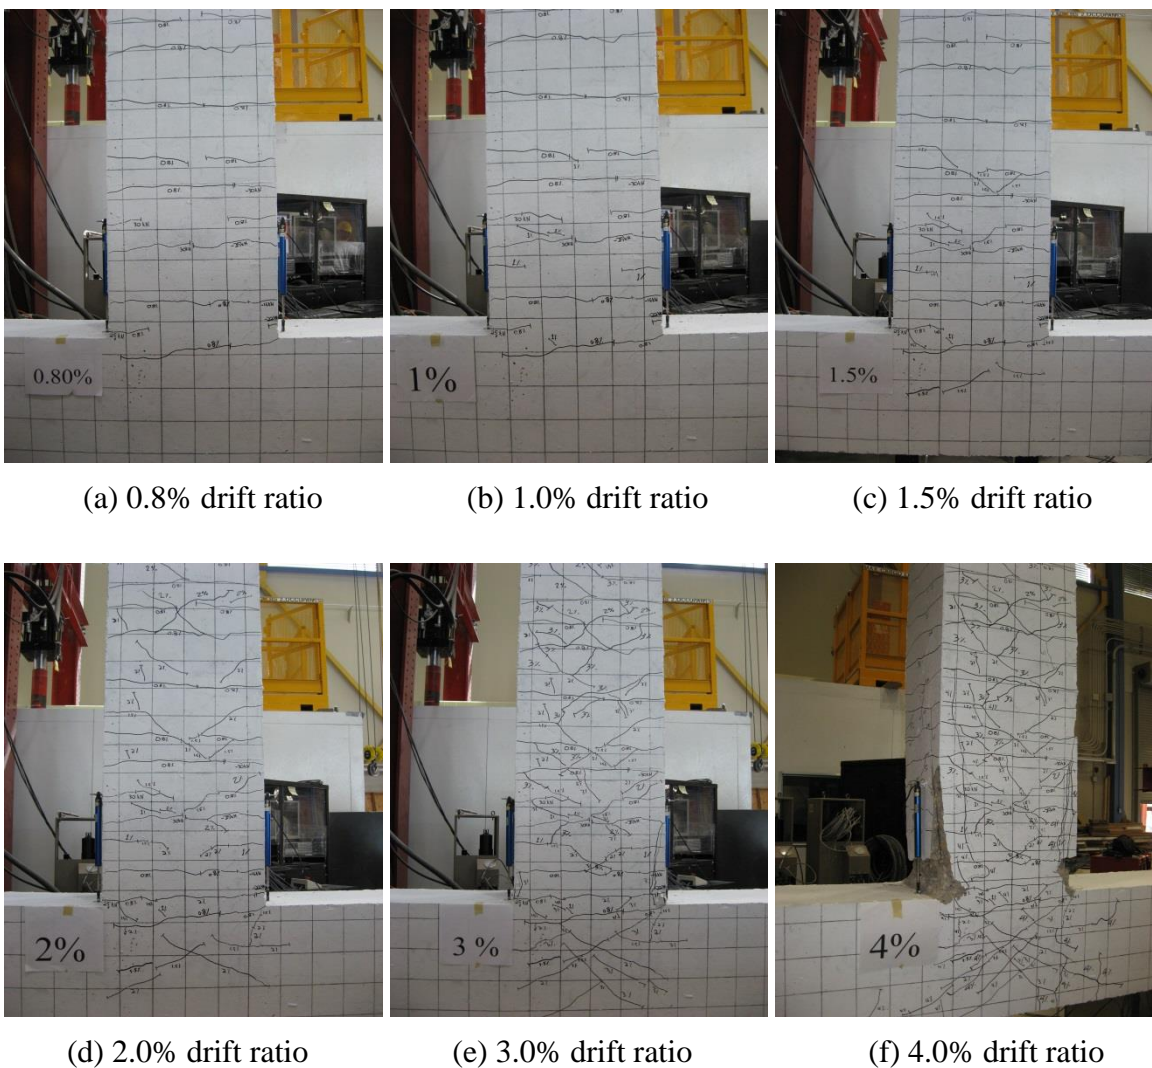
Cracking progression of Specimen II-60-1.0 (continued)
